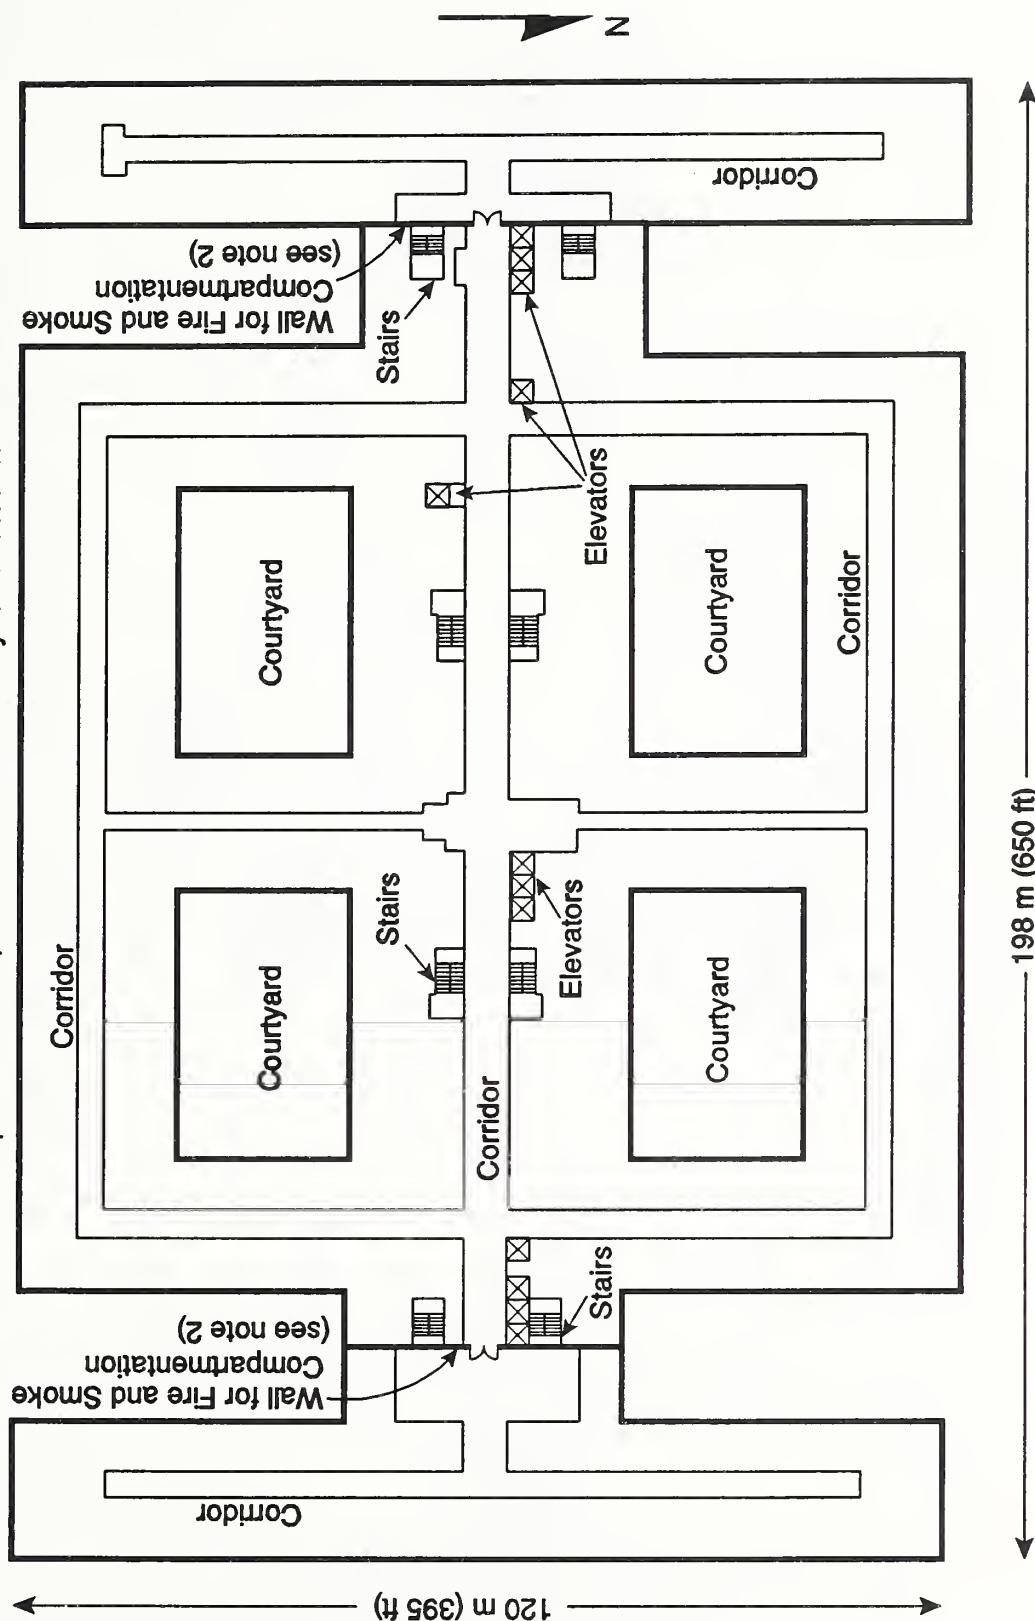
Typical plan of floors 2 to 5 of the Cohen Building
